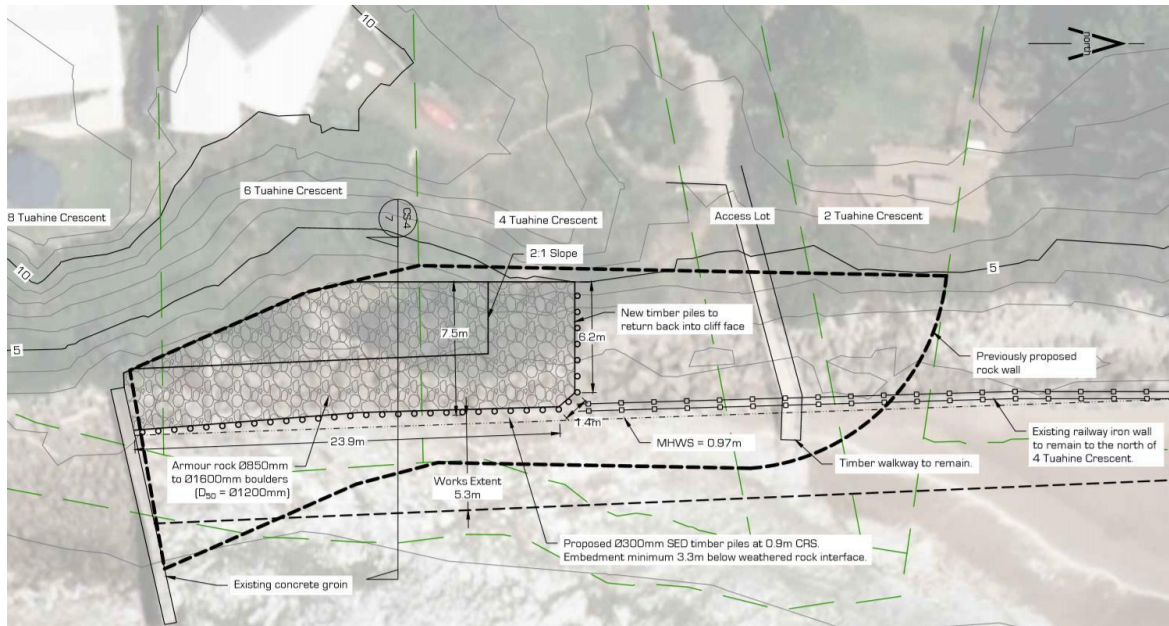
Plan taken from the application of the proposed wall in relation to the previously proposed rock wall by GDC.
